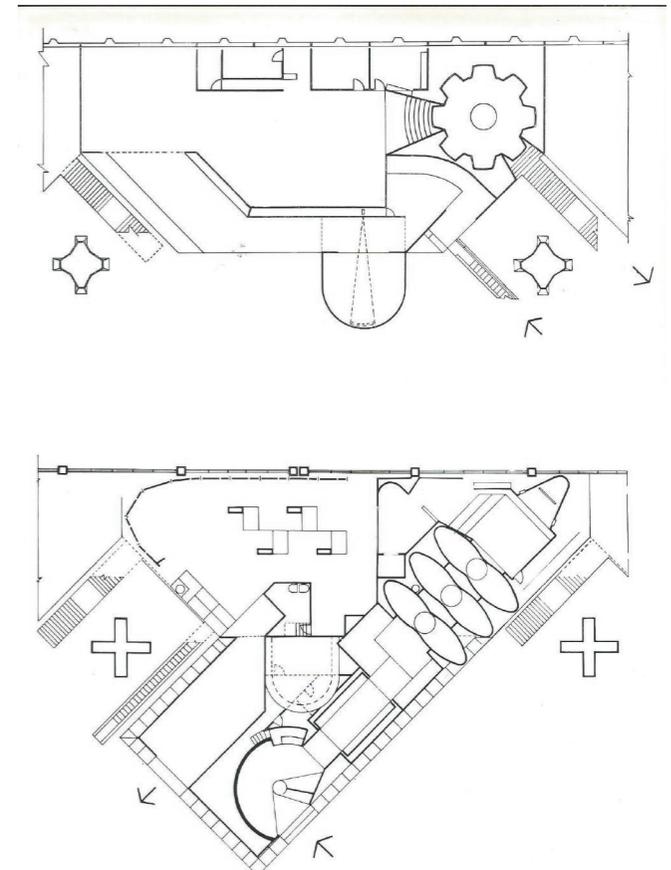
General plan of the international labor exposition designed by Pier Luigi Nervi.
